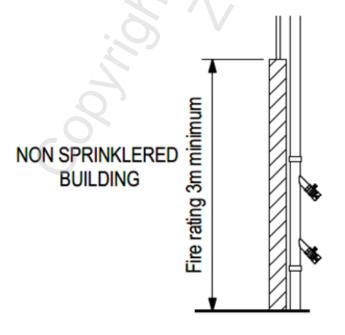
(c) – Non sprinklered building – Hydrant outlet protection Fire rating required – Section view
